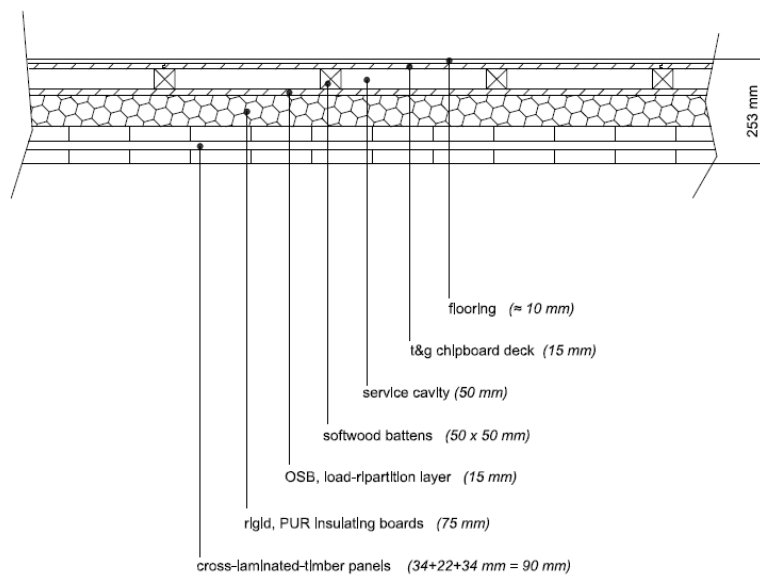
Ground floor D2 (suspended, cross-laminated timber (CLT) floor), cross-section.
